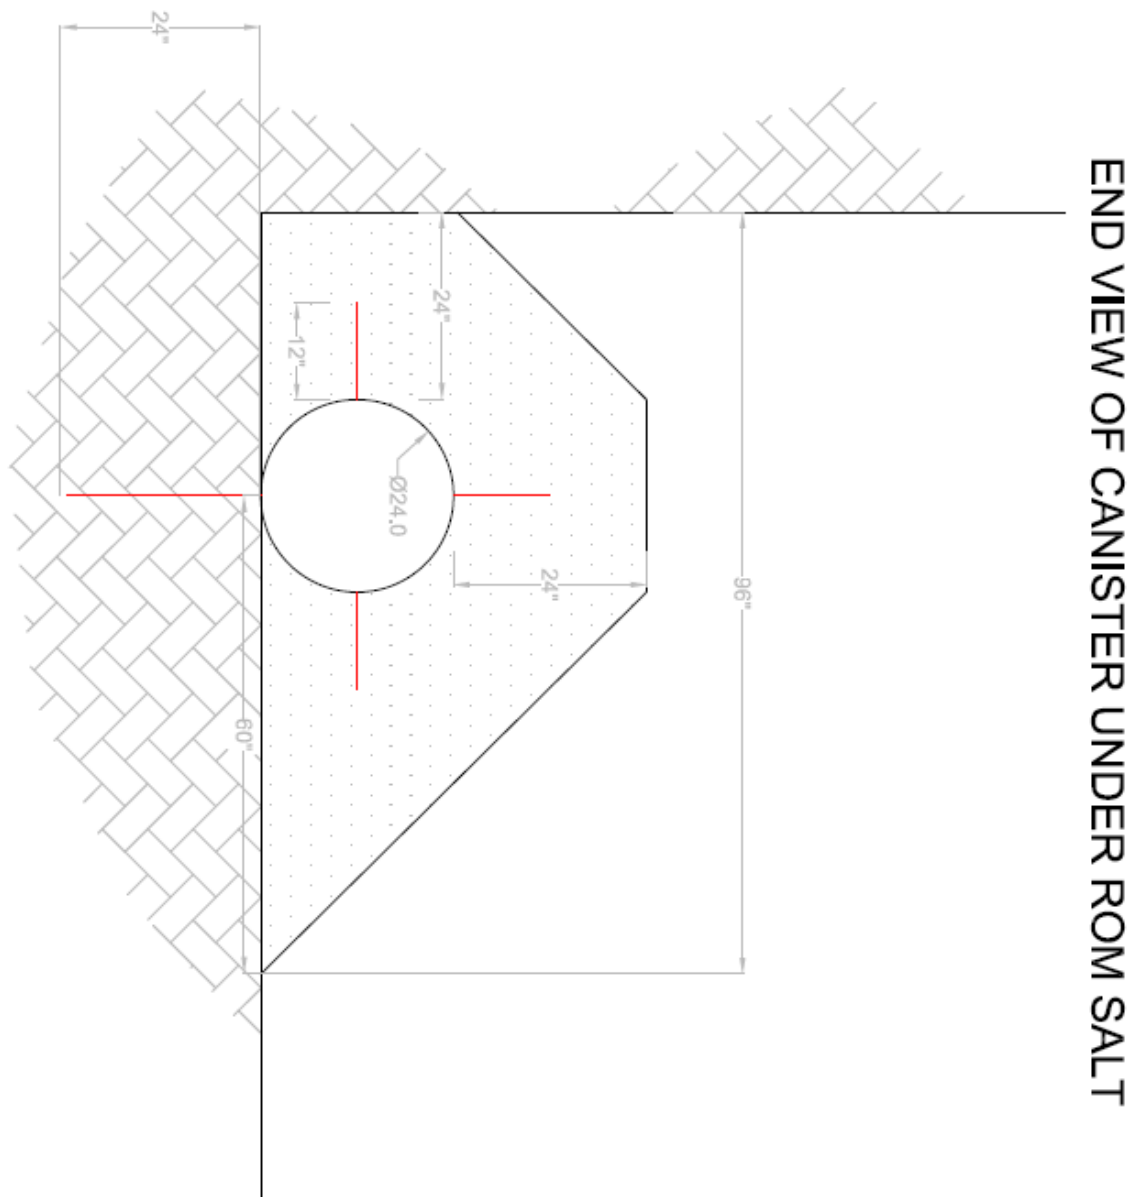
End view schematic of canister emplacement, showing dimensions of pile.
